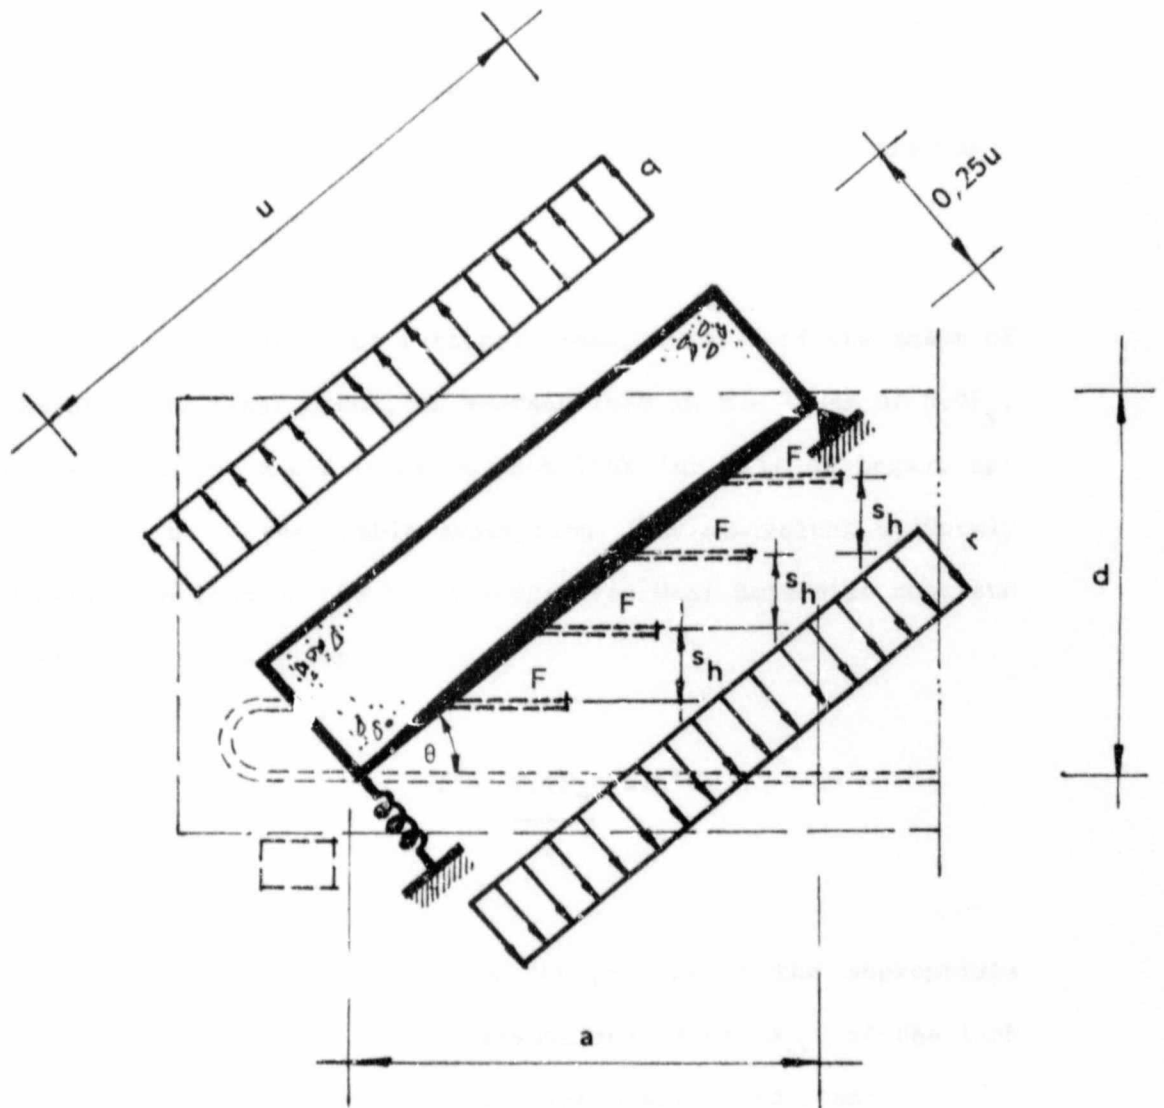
GENERAL, IDEALISED DIAGONAL SHEAR CRACK IN PRISMATIC REINFORCED CONCRETE ELEMENT REINFORCED FOR SHEAR WITH HORIZONTAL LINKS
